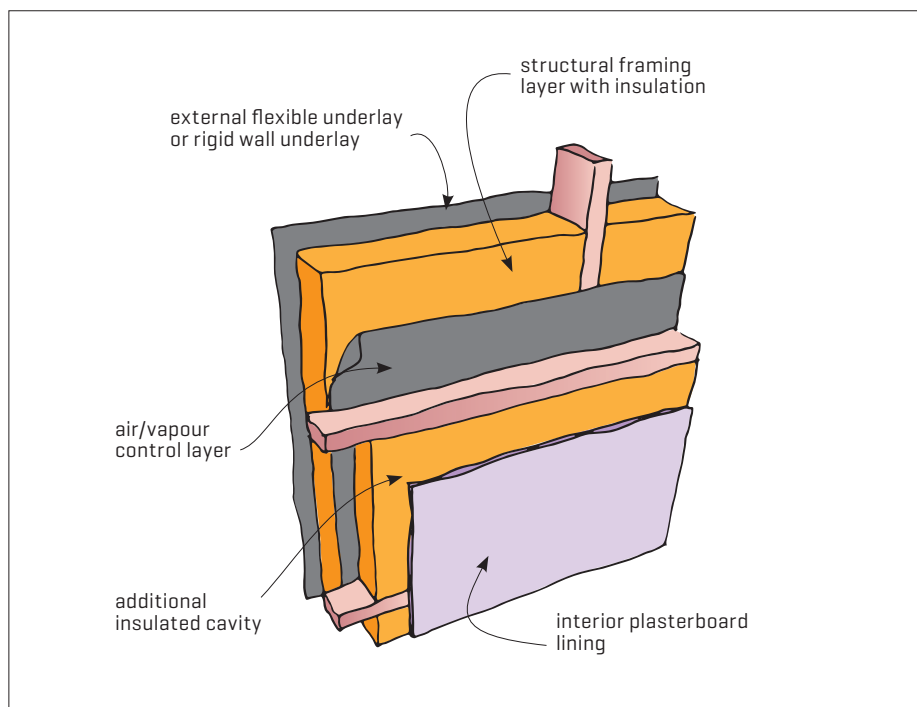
Schematic drawing of timber-framed wall with an insulated timber-batten cavity constructed on the inside face of the structural framing.
